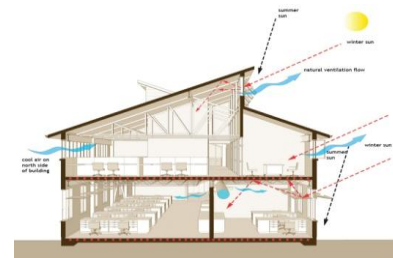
33: Clerestory (American Institute of Architects, 2009).
